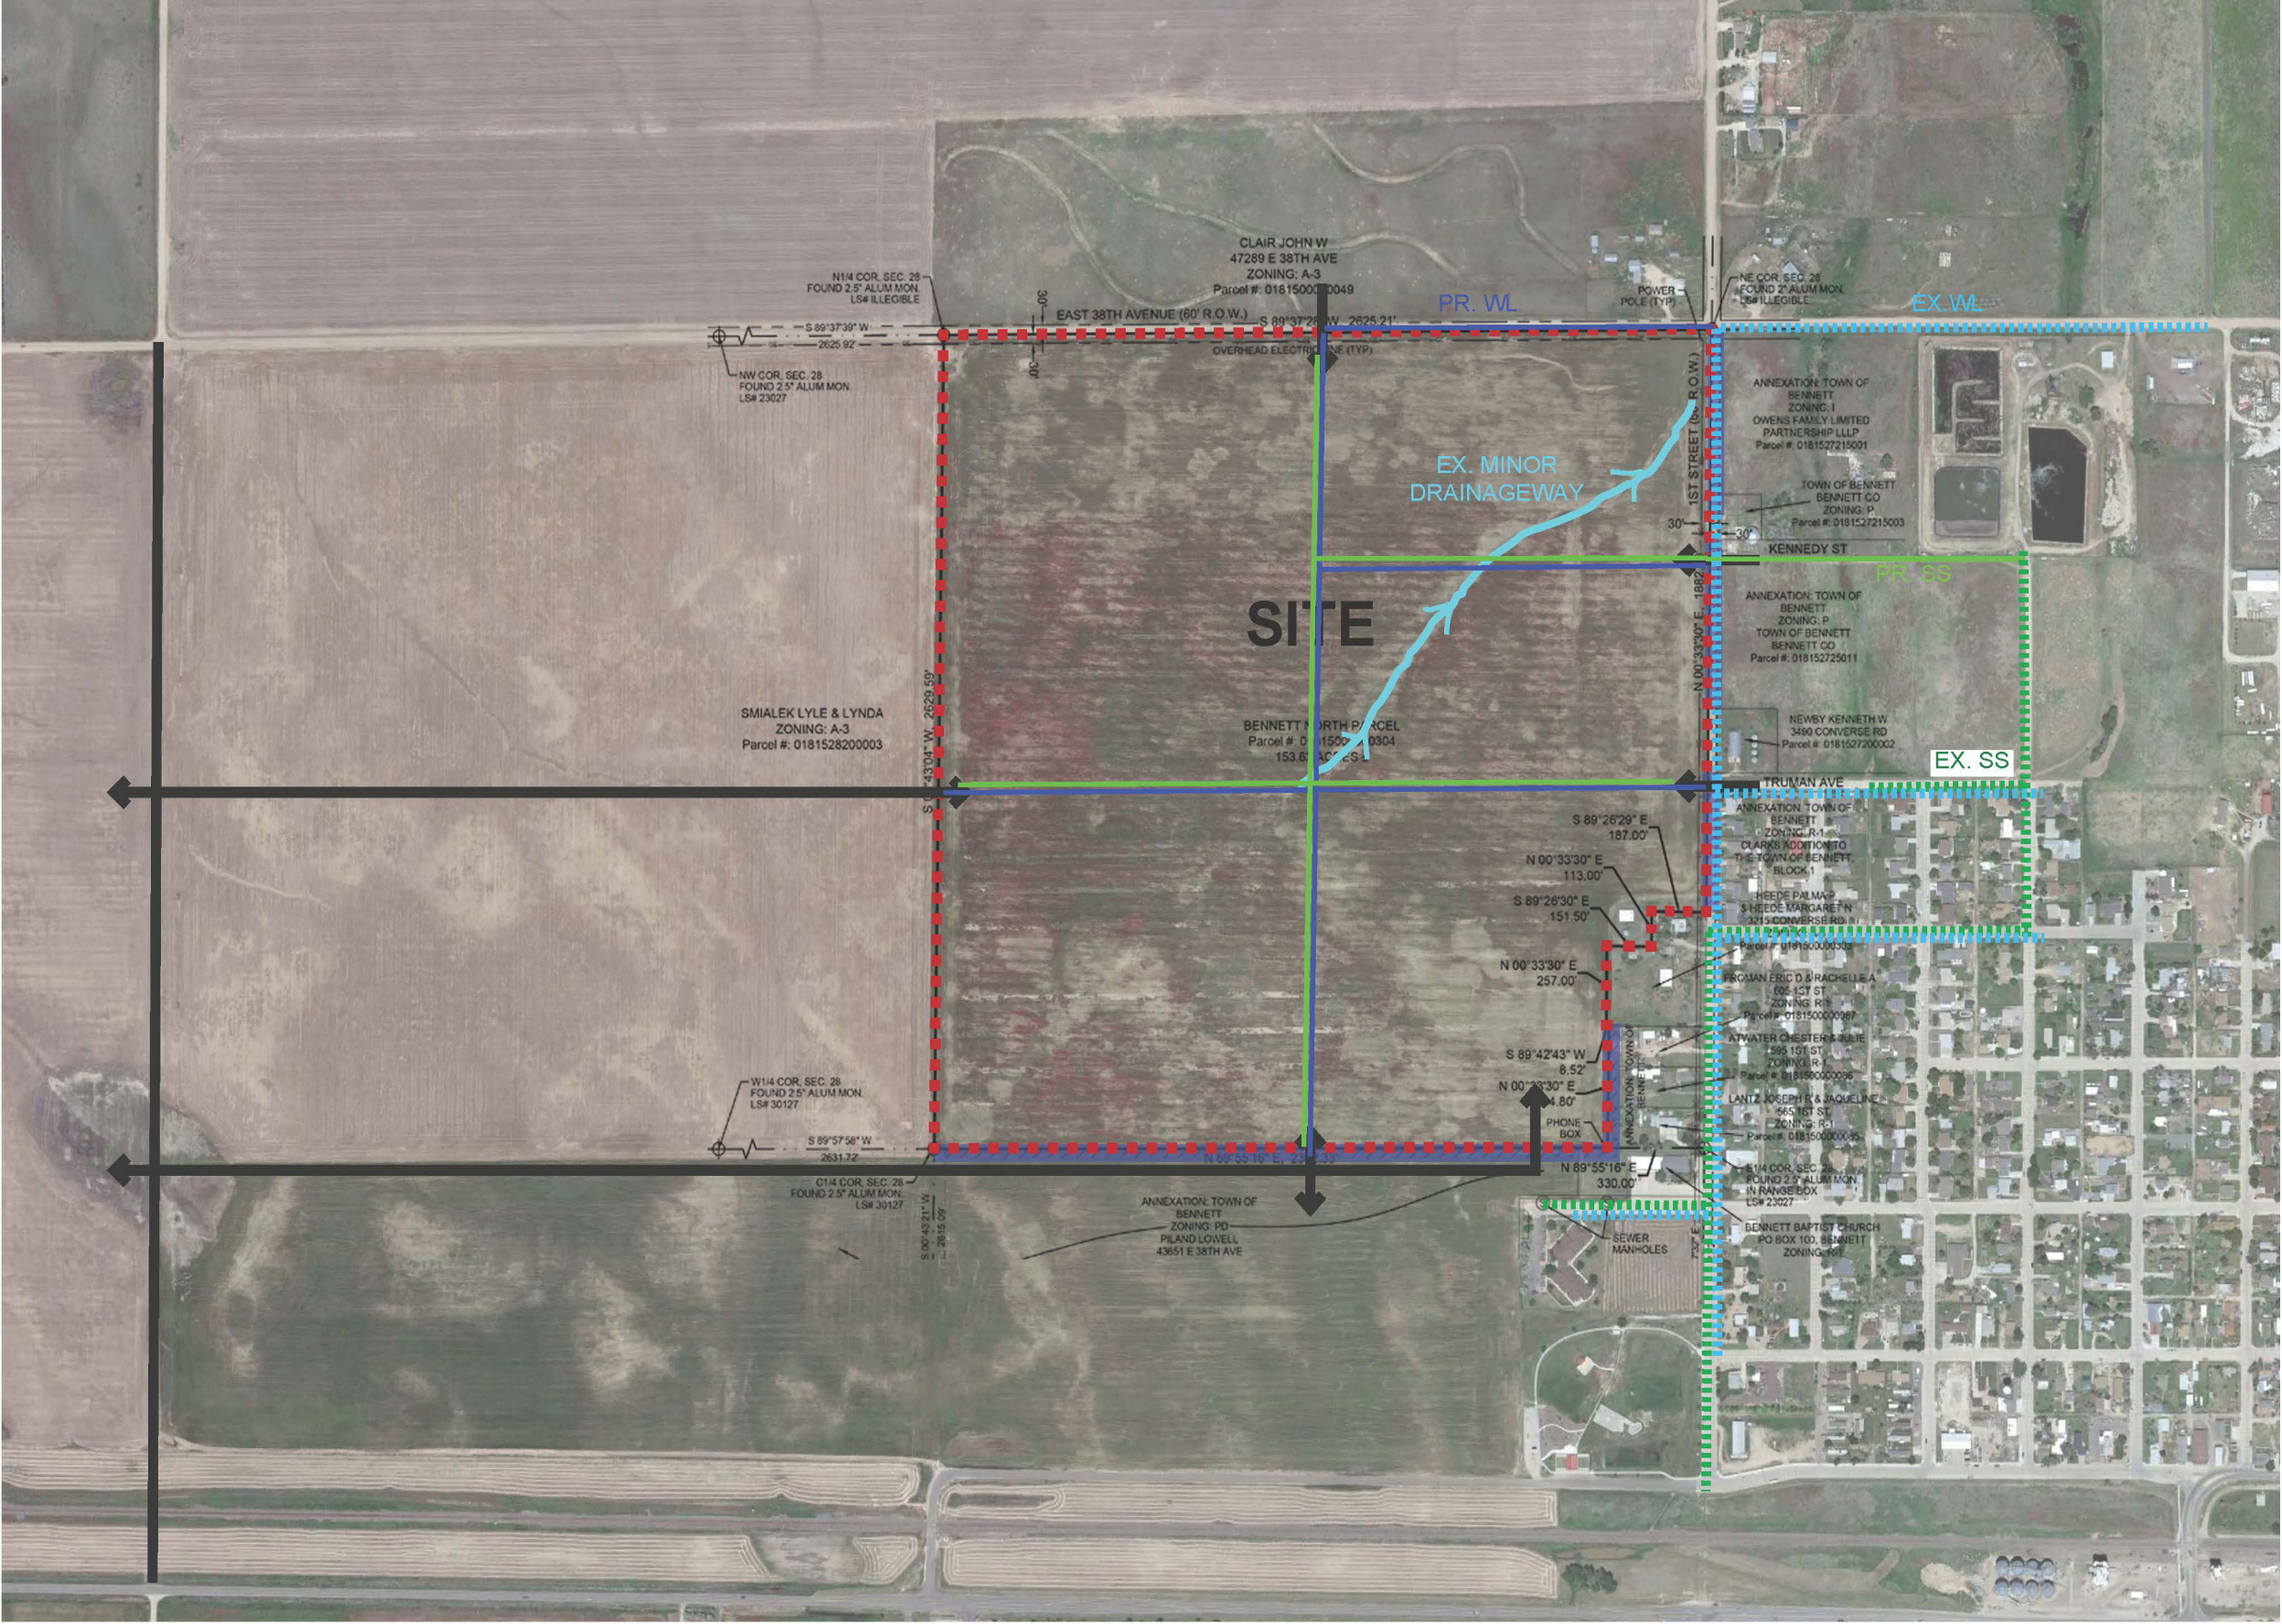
EXHIBIT C - TOWN FUTURE LAND USE PLAN
